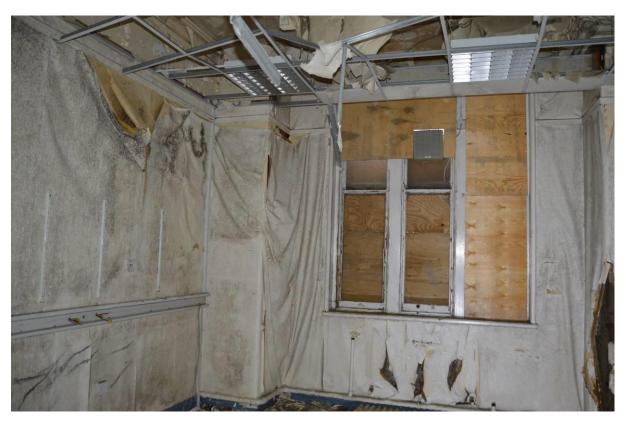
Window in surgeon's sitting room, G7. Facing north west.
